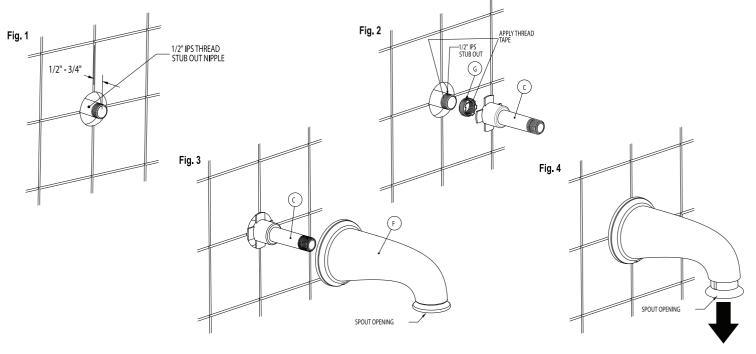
/2" Male Threaded Connection with Short Stub Out Connection
